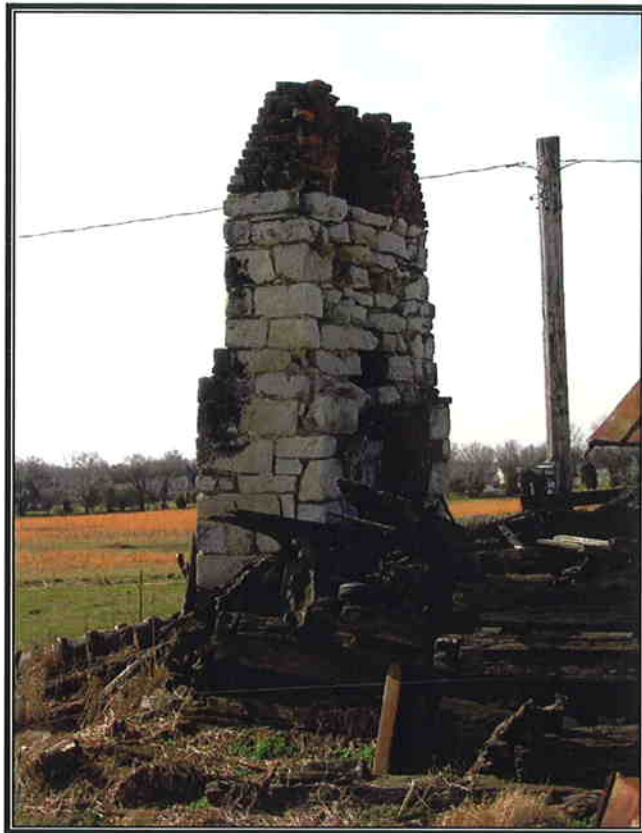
Site 4, Stone and brick chimney associated with collapsed log structure.
